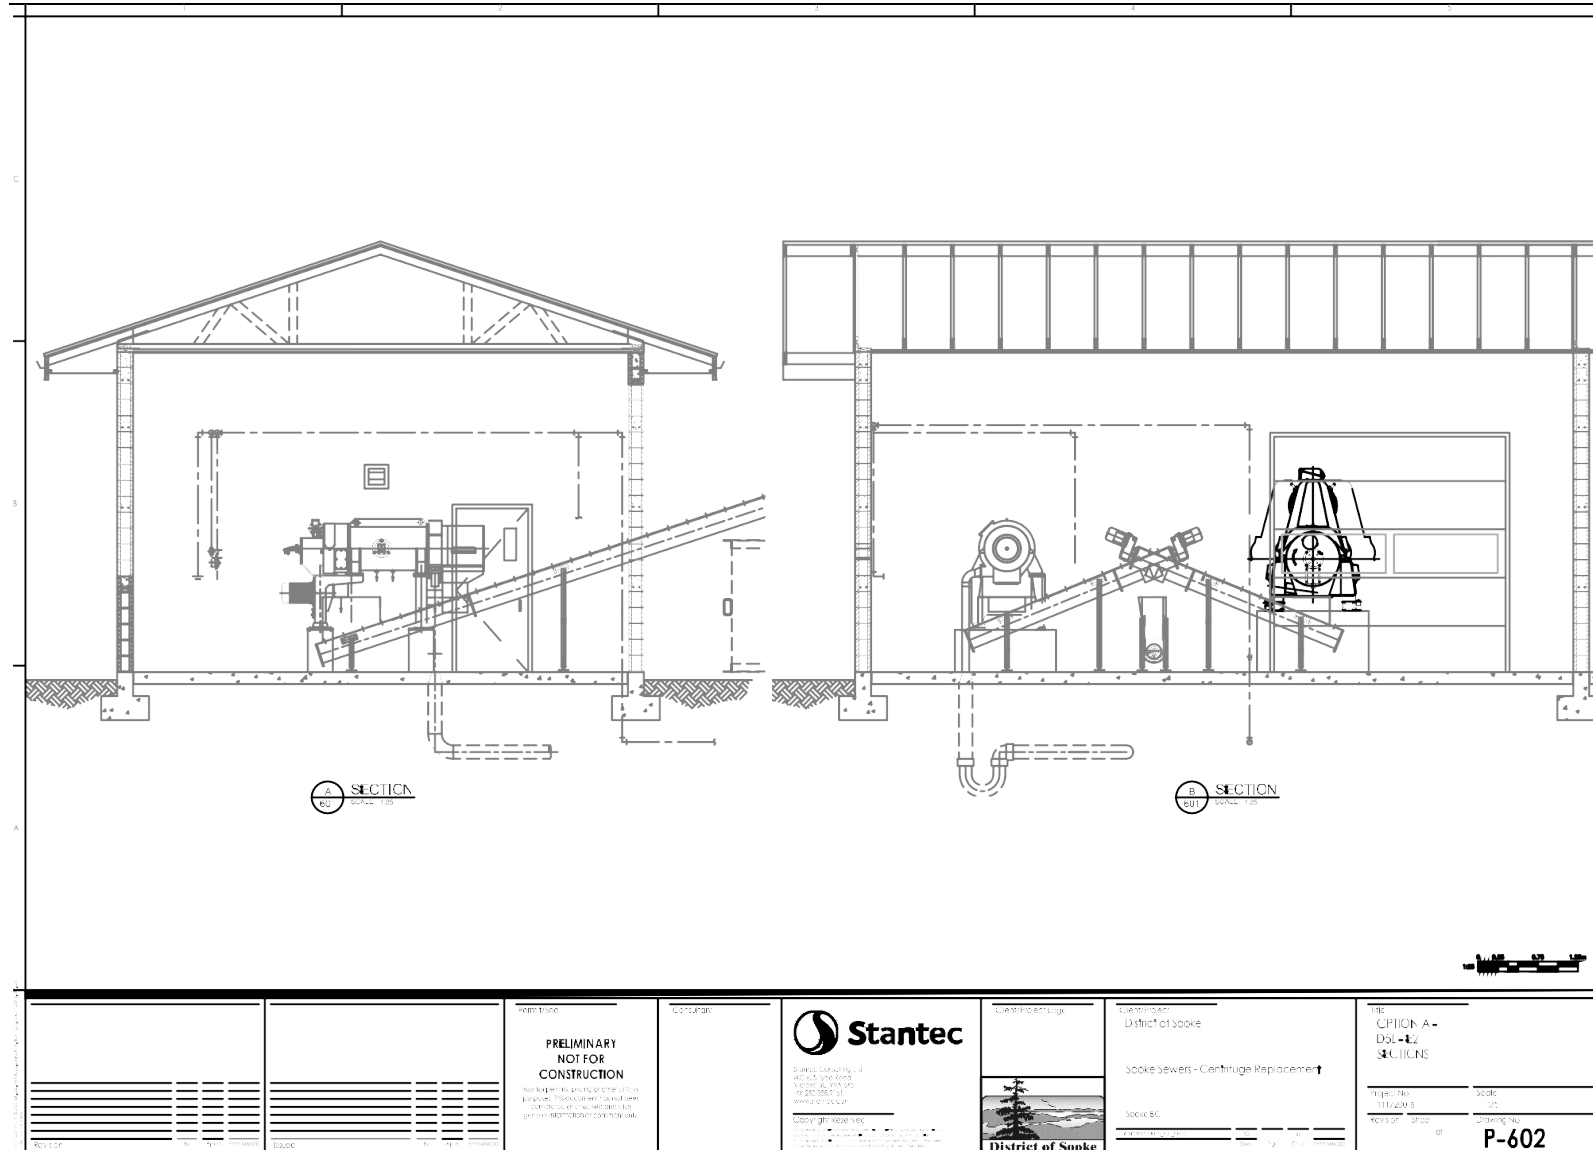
Dewatering Centrifuge drawing - E2 Sections
